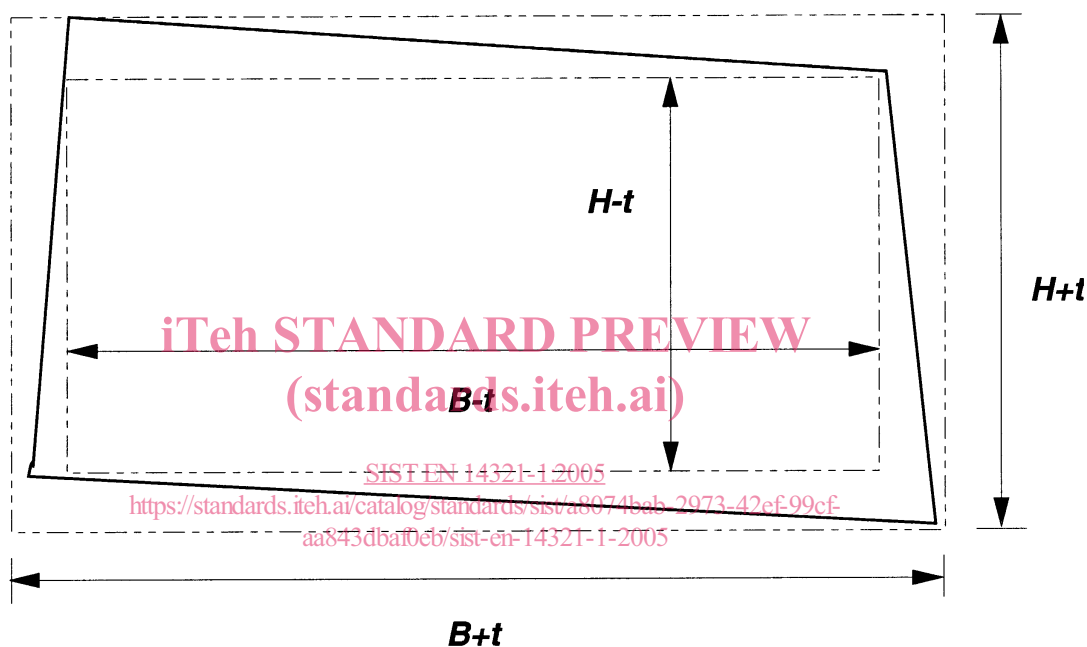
Tolerance limits for dimensions of rectangular panes
